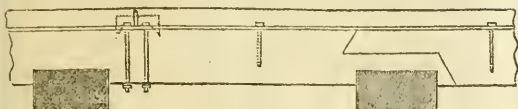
Section of sleepers, showing the joint-plates, and mode of fastening the rails.
